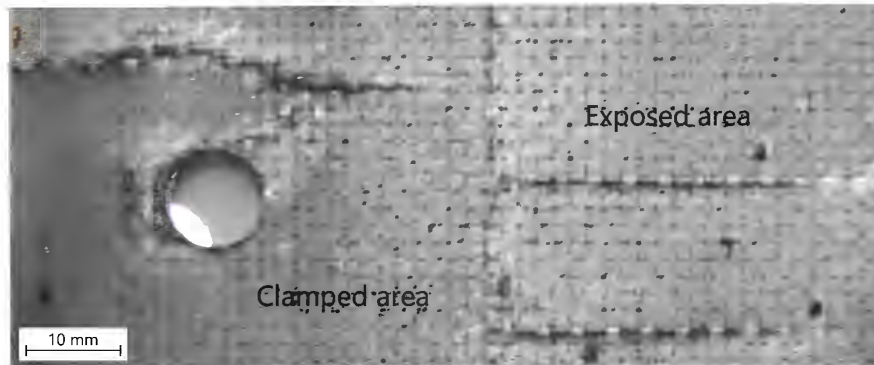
Photographs showing cracking on a blast tested Glass 17/ Super Sap panel
